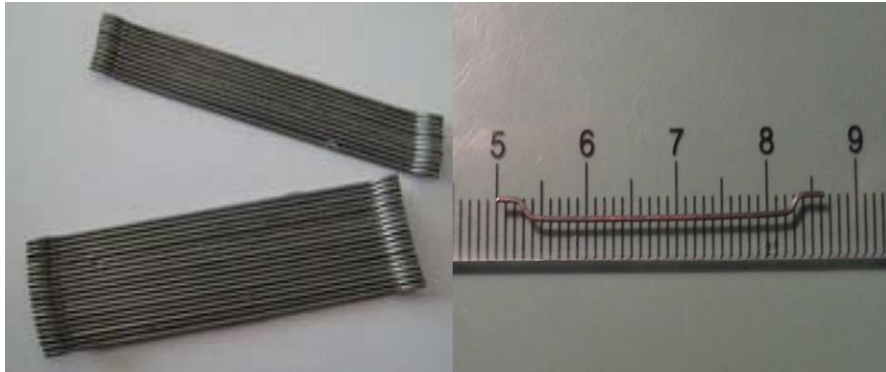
Hook-ended steel fibers Dramix RC 65/35 BN
